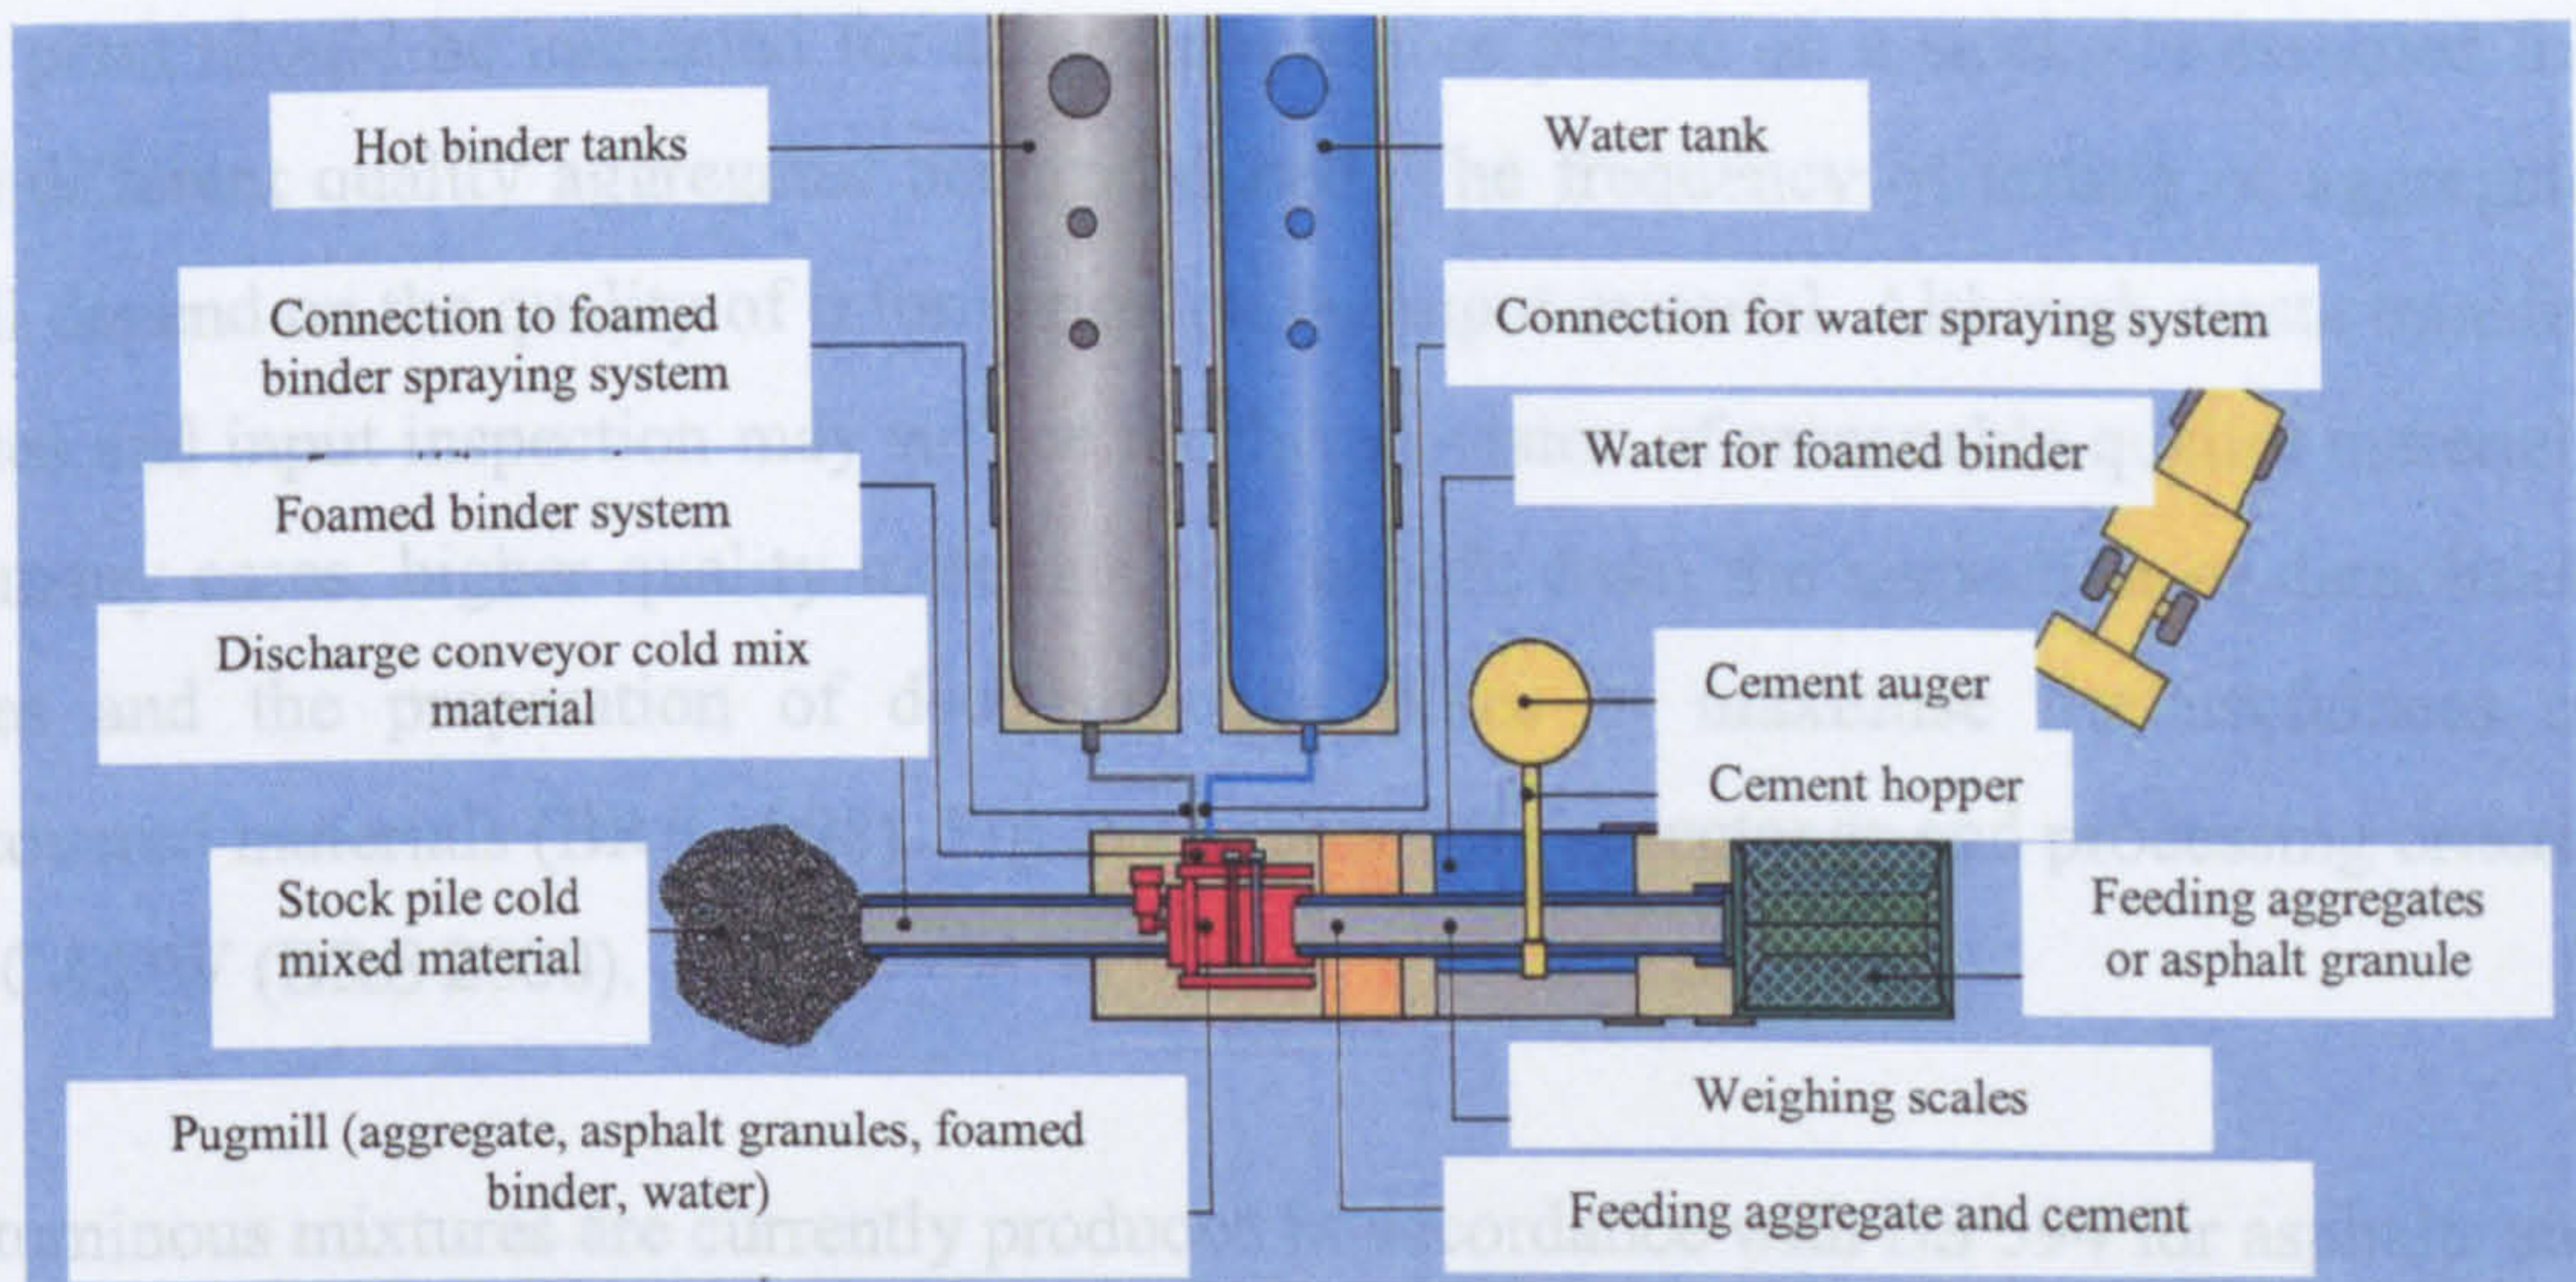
Typical layout of central plant cold recycling (Wrigten 2000)
